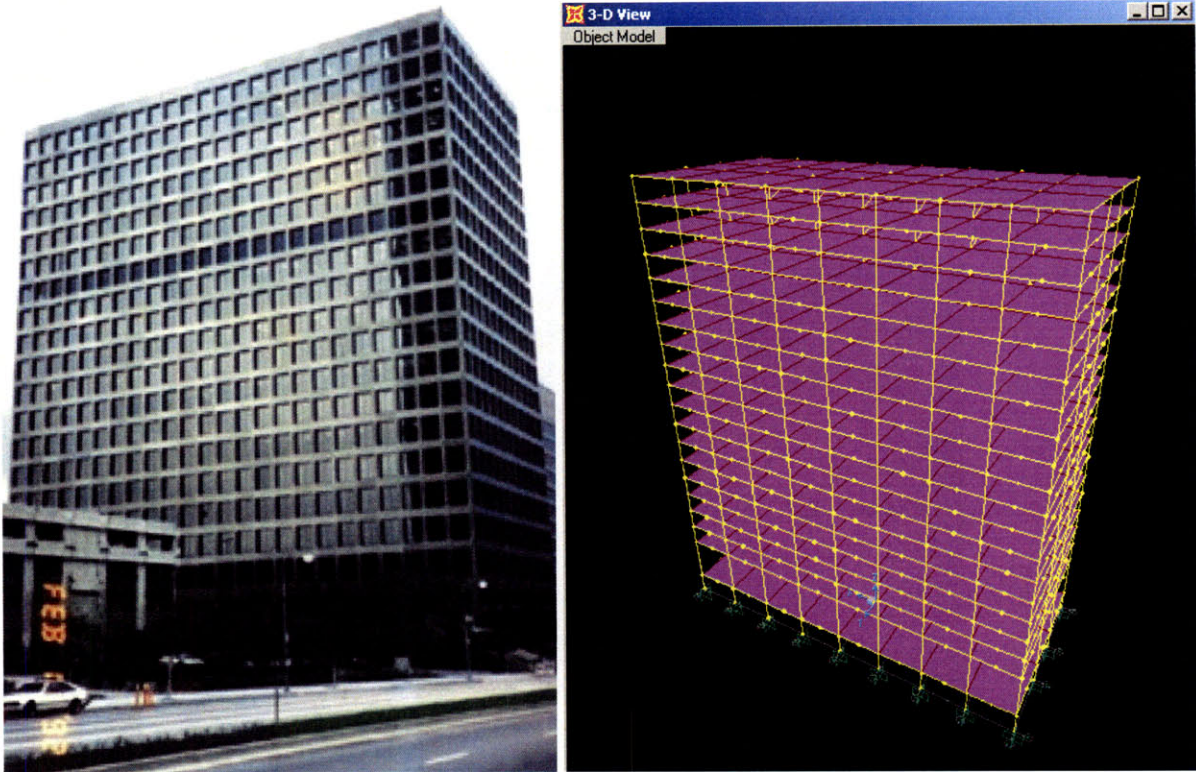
19-story office building in Los Angeles: Actual Building (left) SAP2000 Model (right) (CSMIP, 2007)
